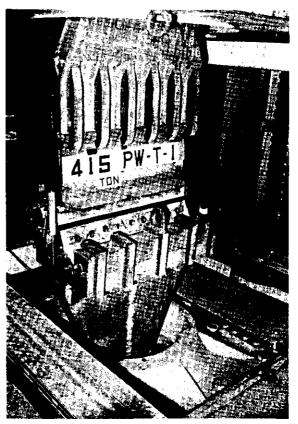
Typical failure mode of "T" connection sheet piles connected by a combination of fillet welding and plug welding
